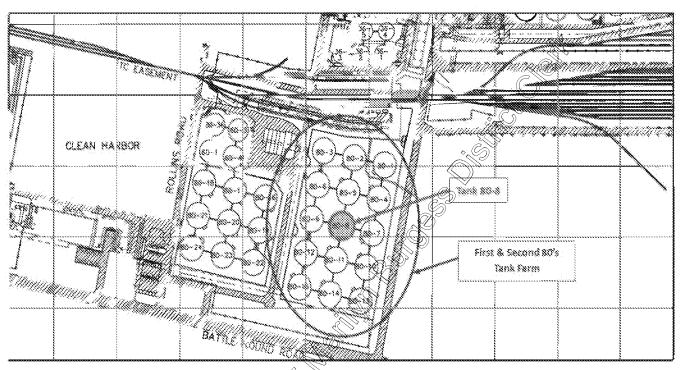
Plot Plan of Tank Farm. This image shows an excerpt from the overall plot plan for the ITC Deer Park, Texas terminal showing the location of the First and Second 80's Tank Farm. (Source: ITC).
